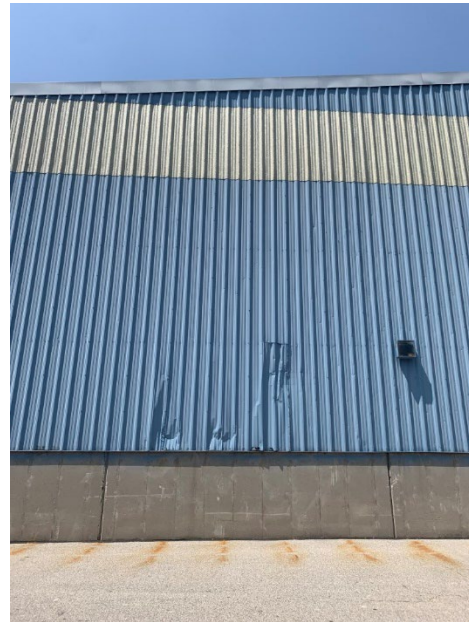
Damaged metal wall panels with dents and holes.
